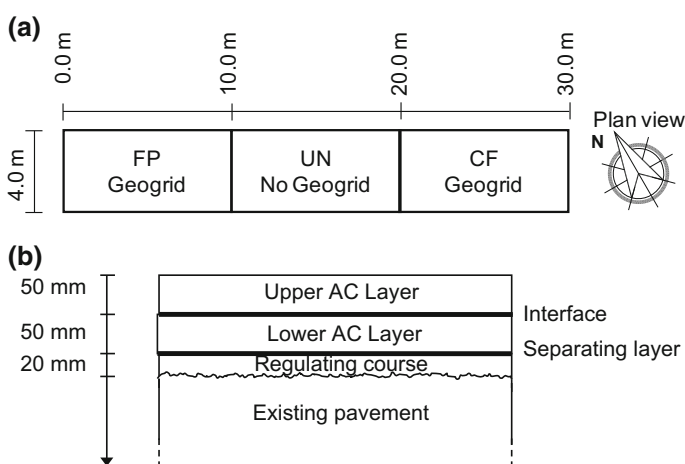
Section A used for the preparation of slabs: a plan view; b cross section
